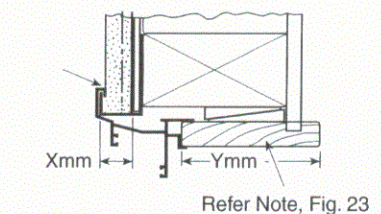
ALUMINIUM WINDOW HEAD DETAIL
